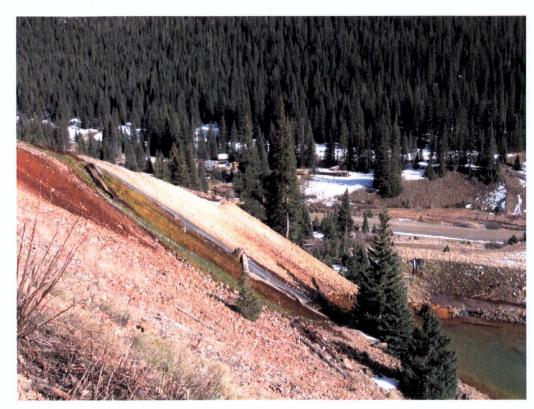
Runoff entering treatment pond in the vicinity of the Mammoth Tunnel.
